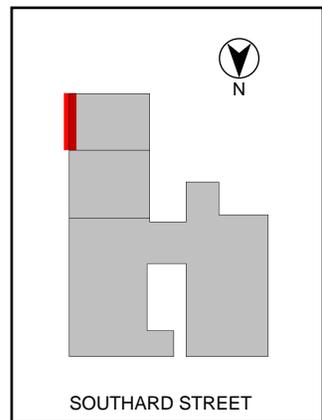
EAST WING, EAST SIDE, REAR ADDITION
